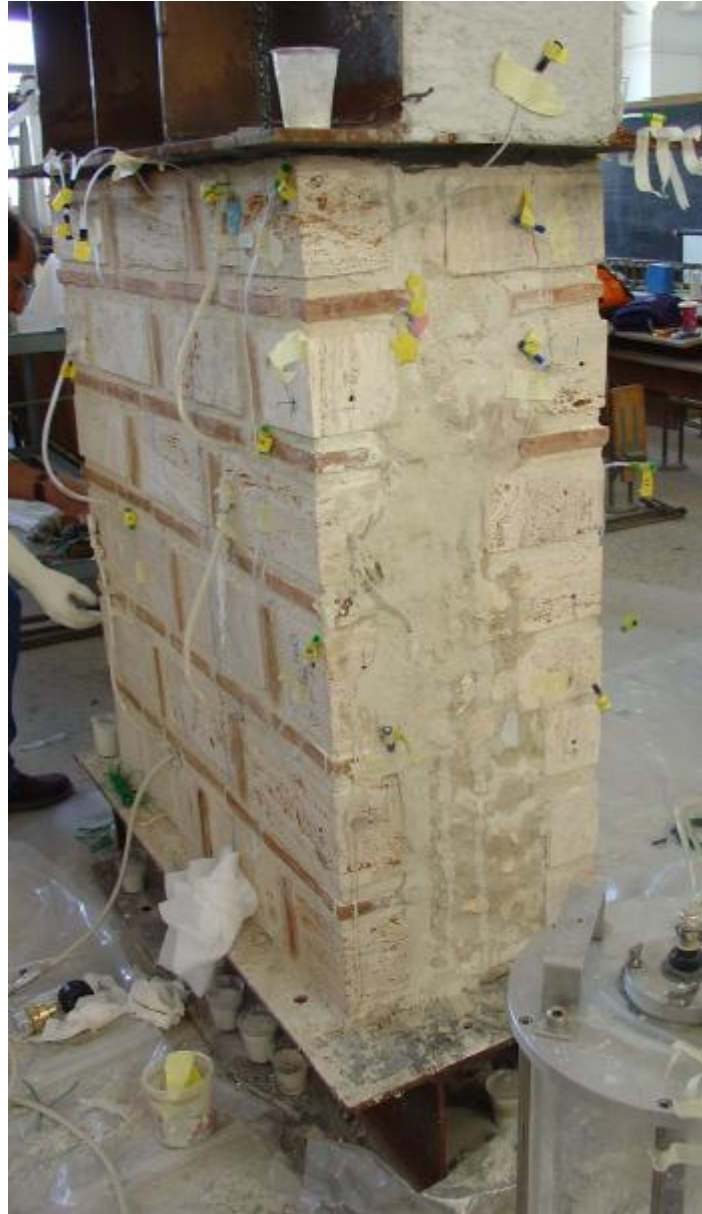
Masonry wallet during grouting (from E. Vintzilaïou – “Lecture notes on Advanced Mechanics of Masonry”)
